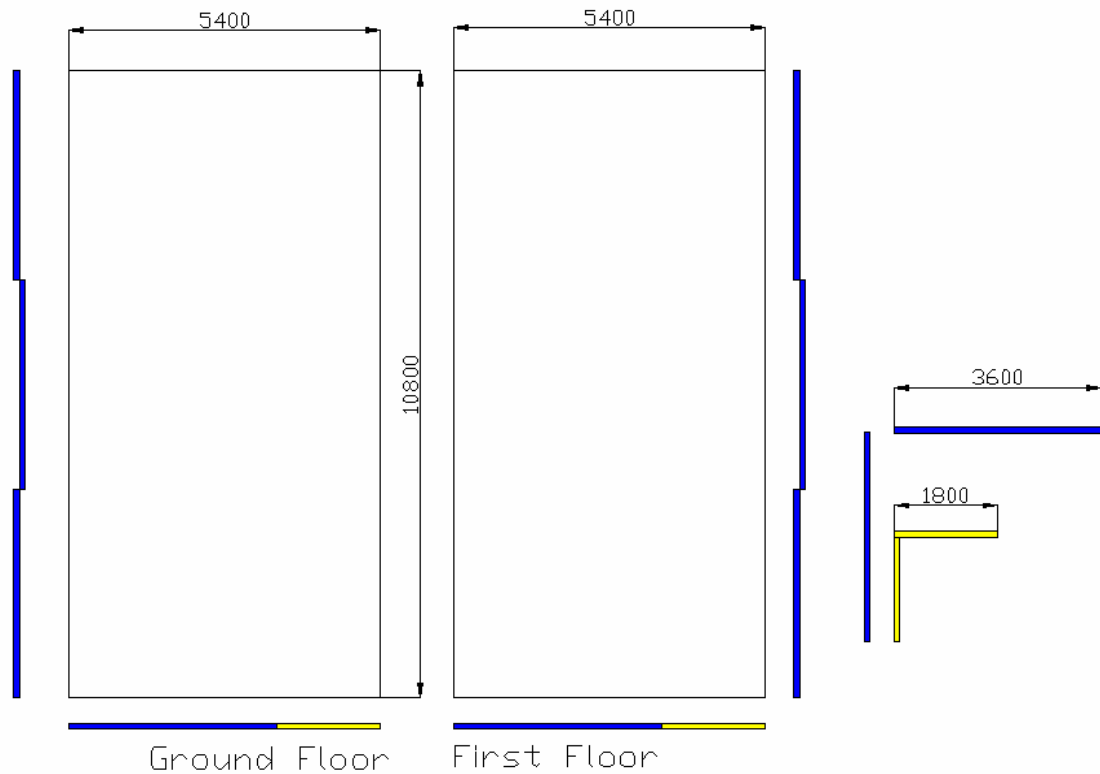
Floor plan of the studied home (in mm). This drawing is for illustrative purposes only and not to be scaled.
